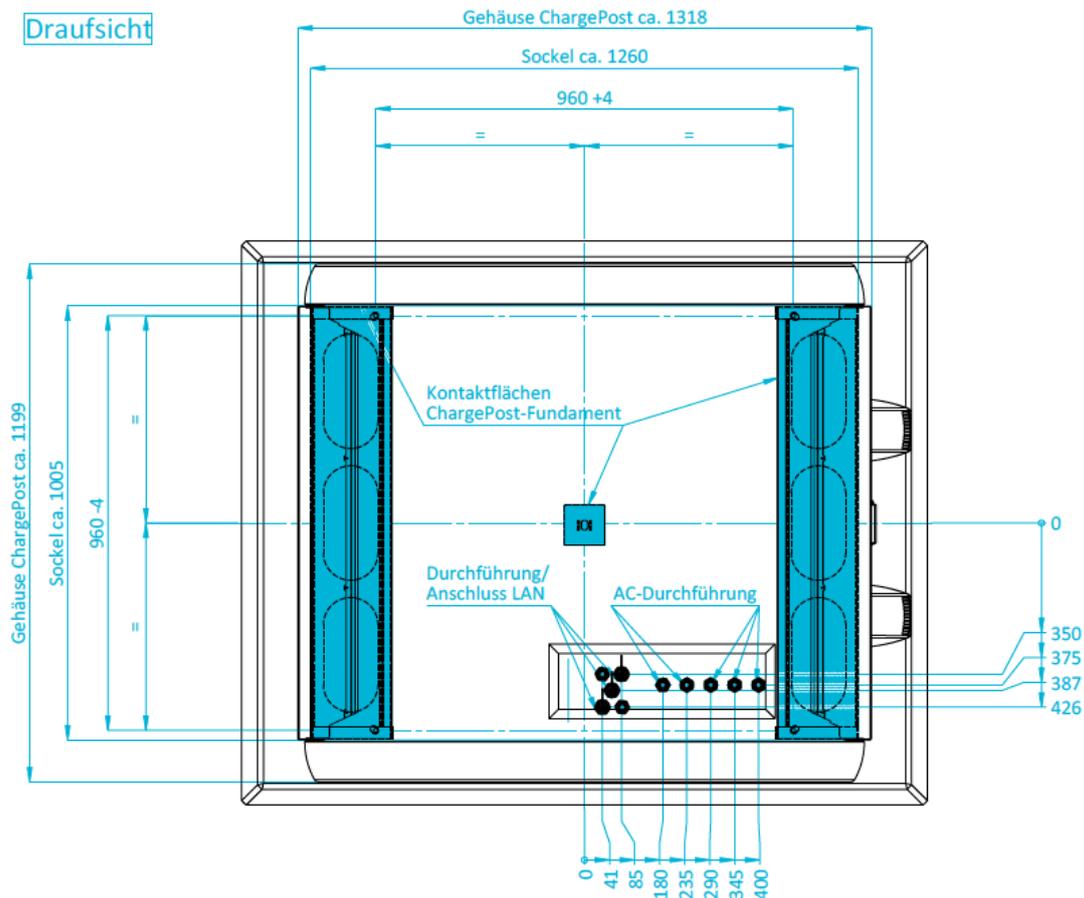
Planning the overall system, top view (detail from the construction drawing)
